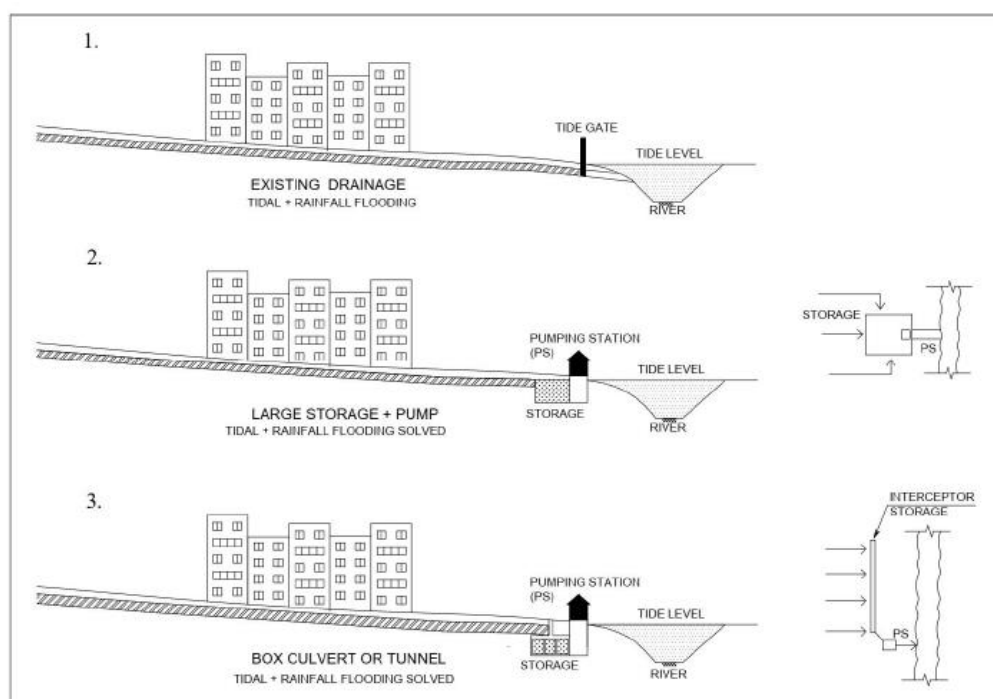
Drainage master plan for Yangon downtown area(source-DWMA)
